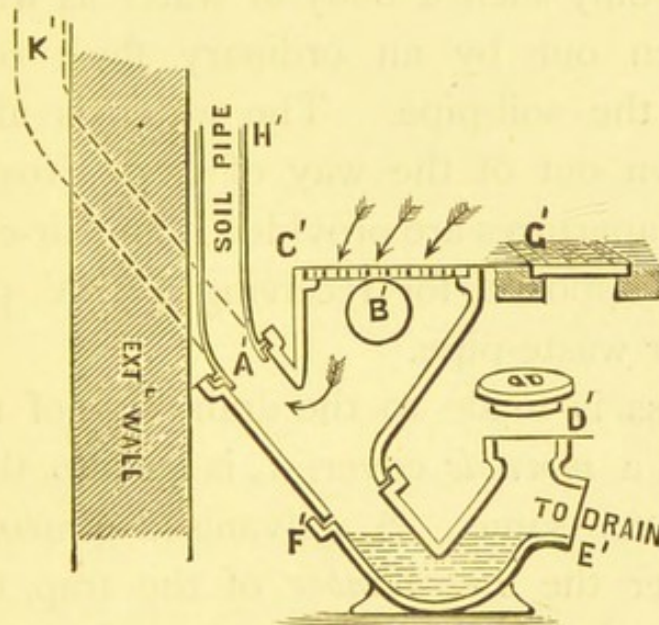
Vertical Section of a "*Ventilating Drain-syphon and Soil-pipe Disconnecter*."\
